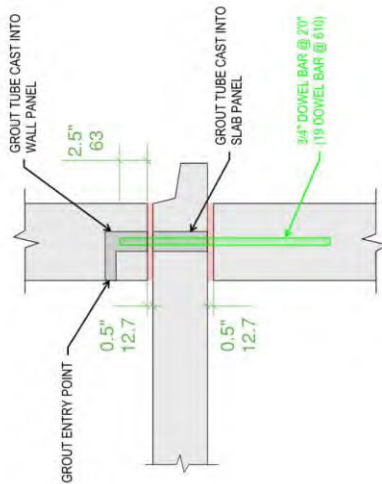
Typical (load-bearing wall panel to slab panel connection (with dowel continuing into panel above). This detail occurs at some select wall panel locations within the building.
